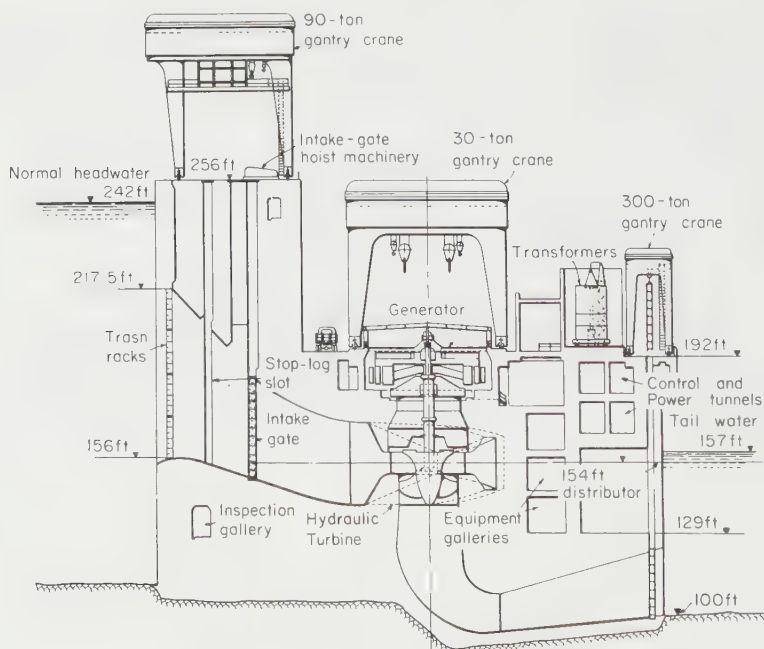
Moses-Saunders hydroelectric plant, St. Lawrence River. Section, American side.
